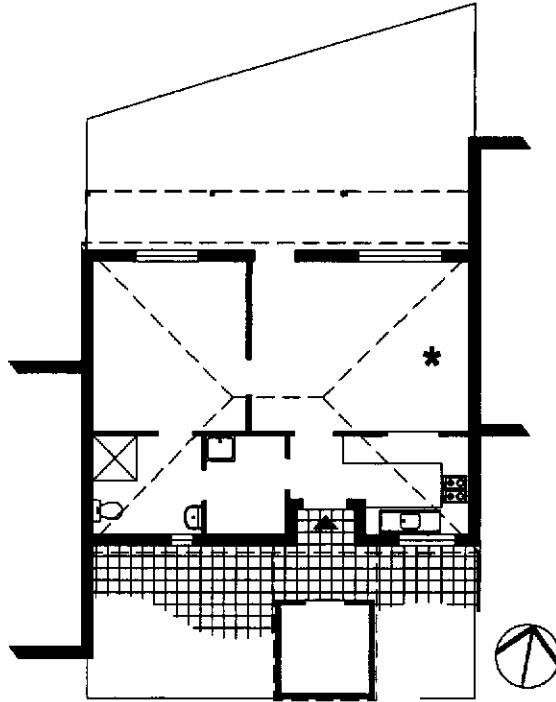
Floor Plan Dwelling 1G – Monitored in summer and winter
